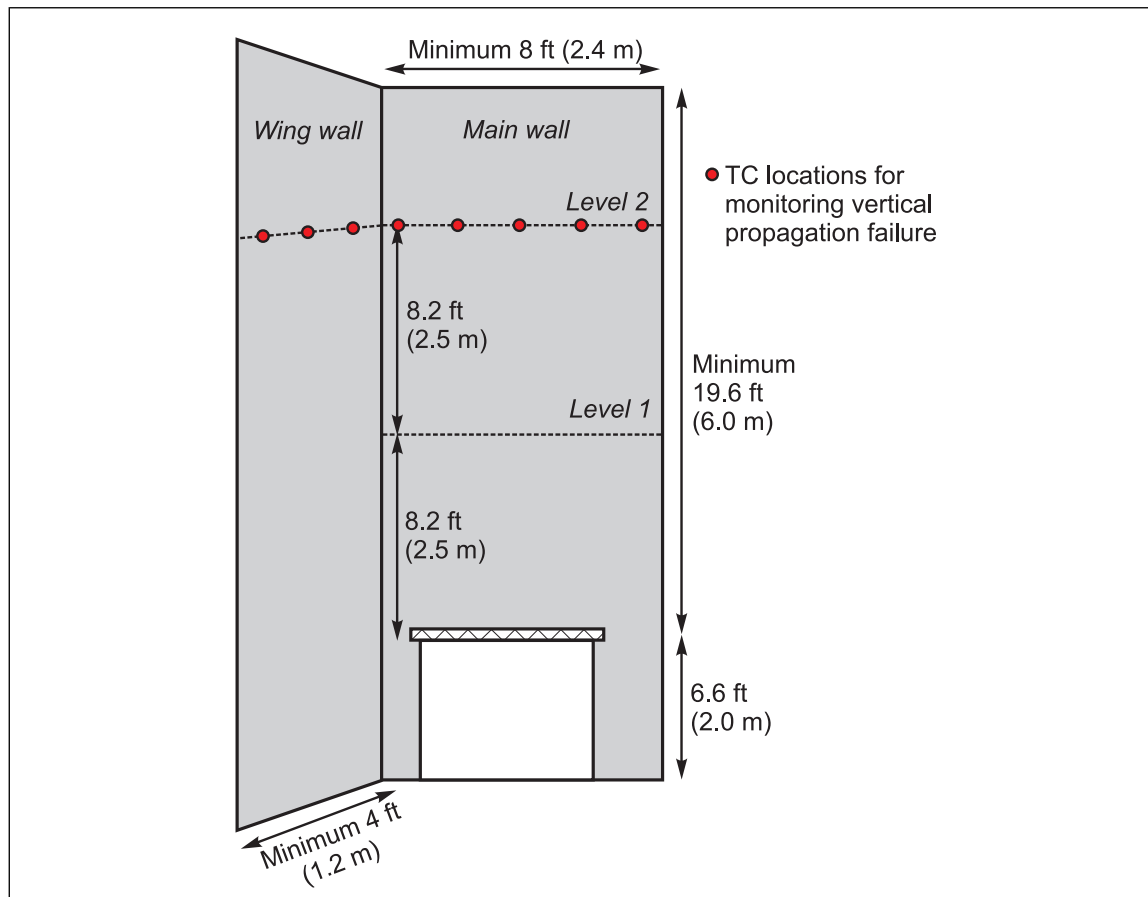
Schematic of wall specimen and dimensions in BS-8414-1 (not to scale)
